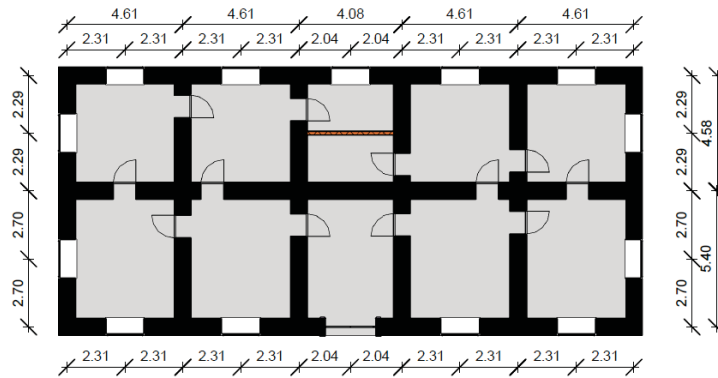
Plan of the building (longitudinal and transverse walls in the X and Y directions, respectively).
